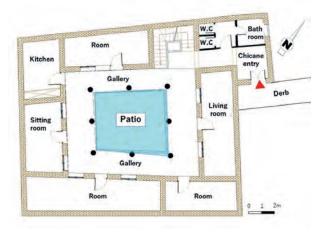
Ground floor plan of an ottoman house located in Bab El Hadid. (Source: the authors).
